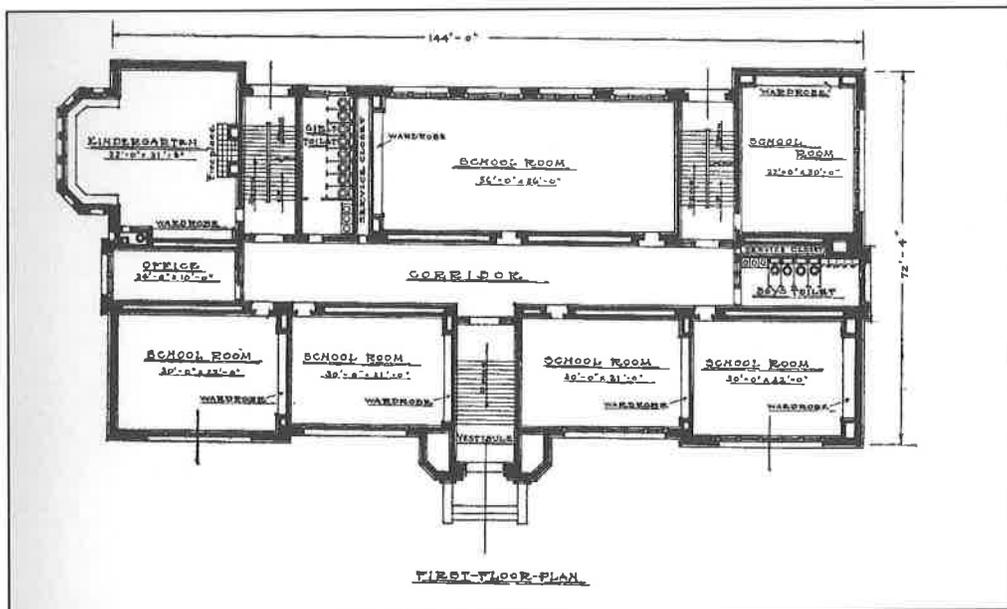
Lincoln School first floor plan from *Twenty-five Years of School House Planning
